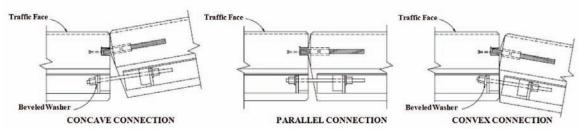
Connection of the barrier segments in FDOT Portable Concrete Curb [10]
